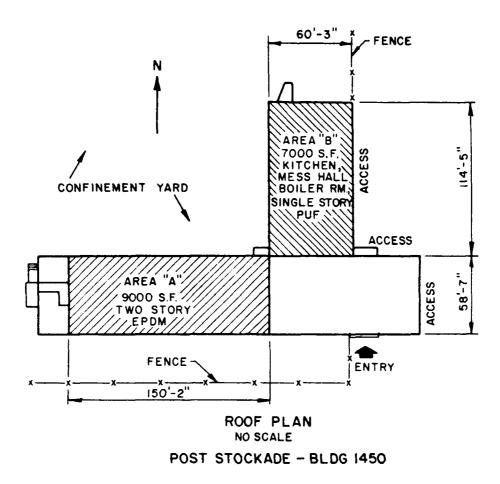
Building selected for EPDM and PUF roofing at Fort Lewis.
